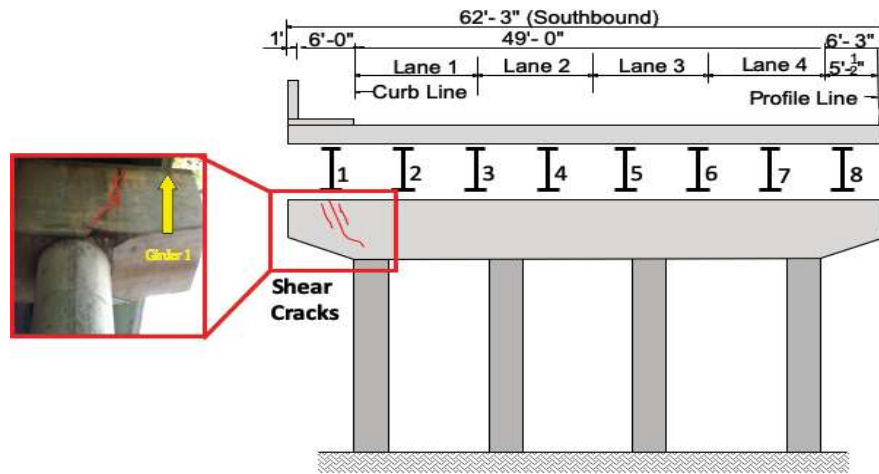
Pier-Cap Cracking Location of Span 2 SB Pier 1W
